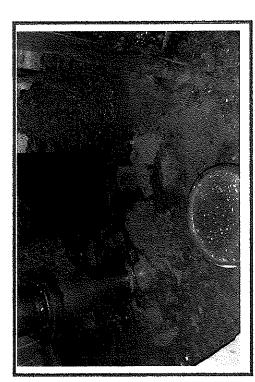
Water with sheen in the elevator shaft in the basement of the Wilson Building.
